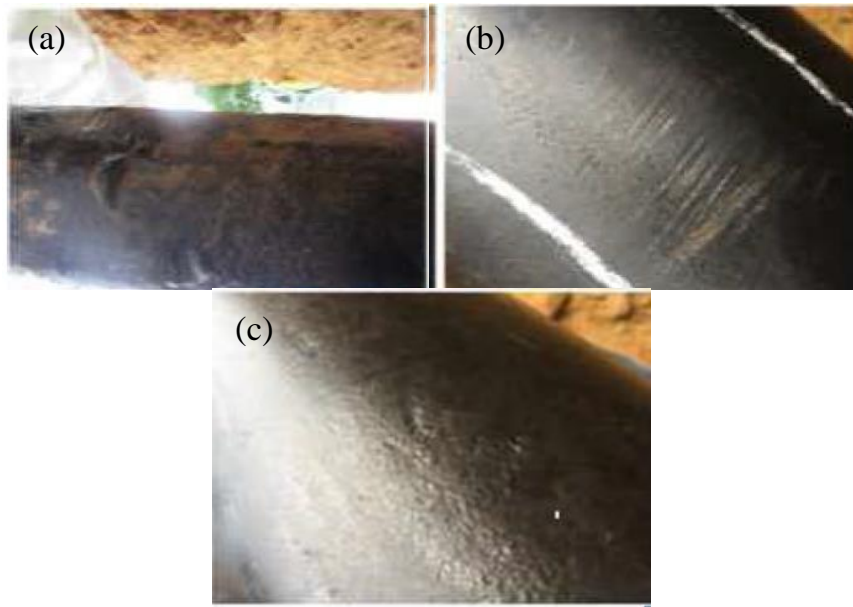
Coating degradation(a), mechanical scratches(b), and surface pittings(c) [33].
